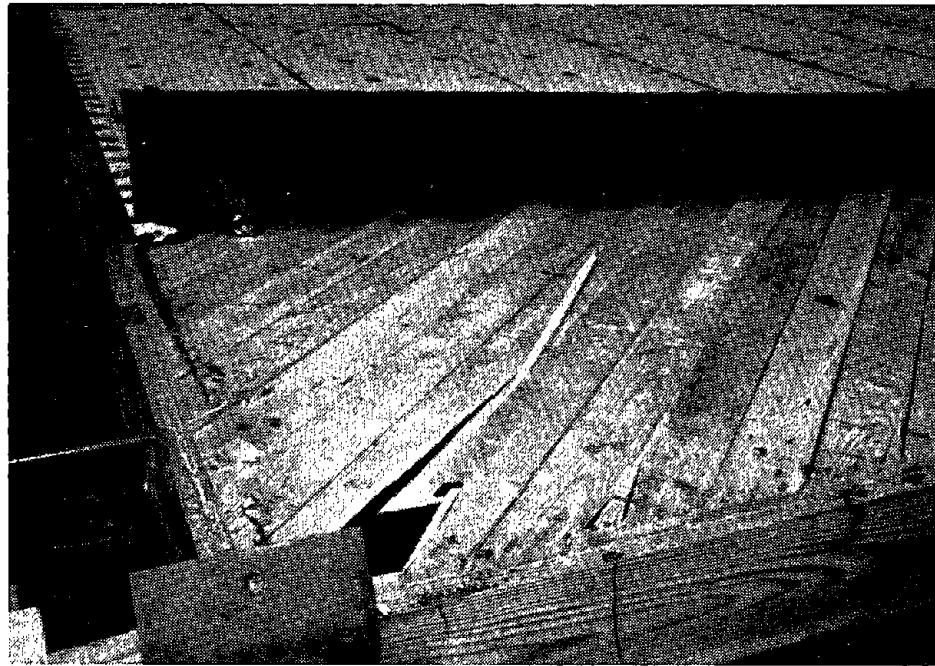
NORTHWEST CORNER OF DIAPHRAGM I AFTER TEST.
